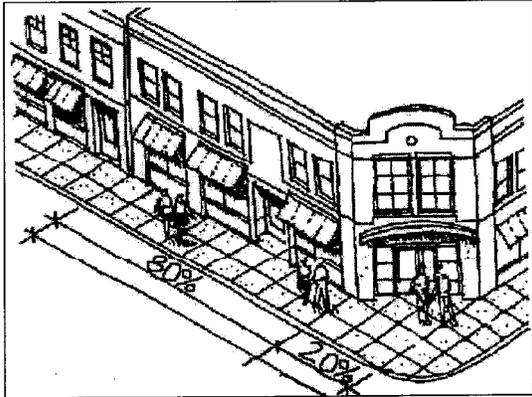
Street frontage should be primarily dedicated to storefront uses. A corner site may orient its primary entry towards the corner for emphasis as above.
